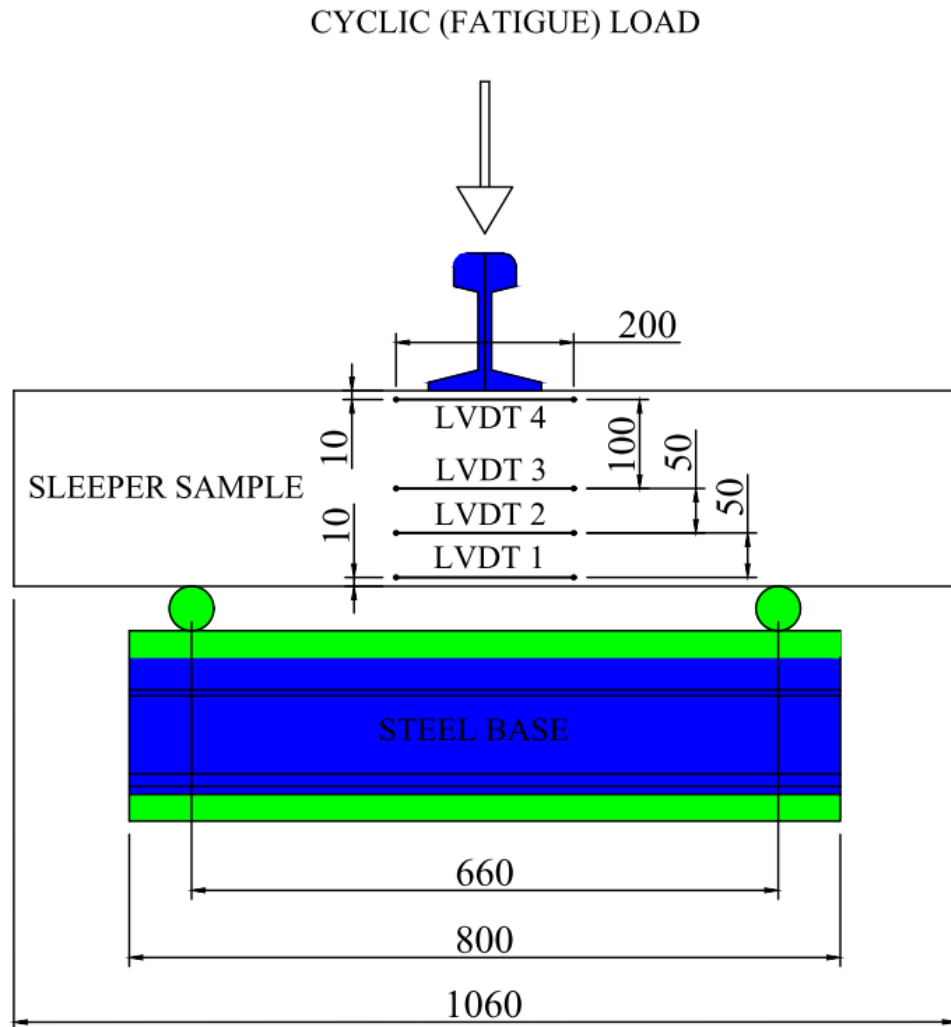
Details of the fatigue test set-up (dimensions in millimetres)
